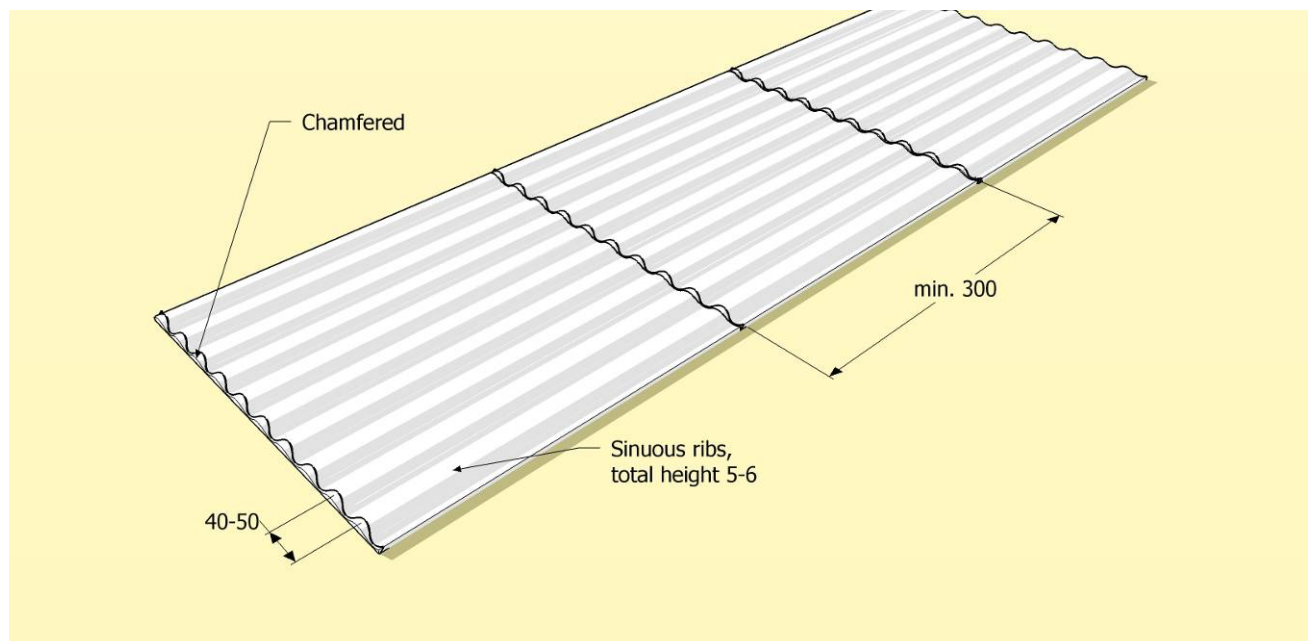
Spacing and dimensions of sinuously ribbed pattern
